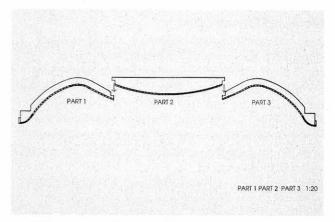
In contrast to the original the aim was to study how the ceiling could be made out of elements. VKRY, architect M. Heikinheimo.
